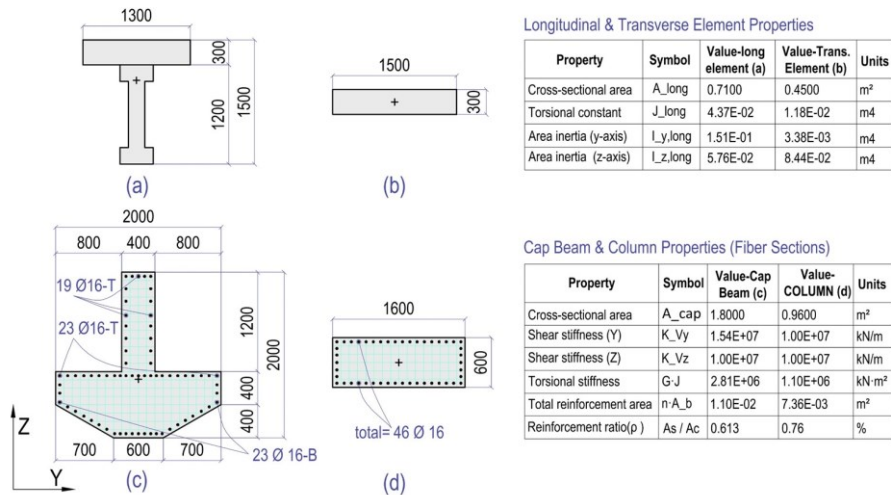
(a) Longitudinal Grillage sections (b) Transverse Grillage sections (c) Cap Beam (Fibre Section) (d) Column (Fibre Section)
